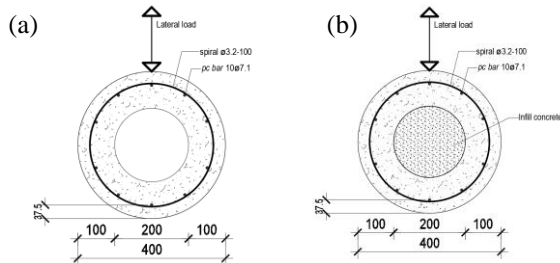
Test specimens of spun piles; (a) spun piles without concrete infill (S-TB-1 and S-TB-3); (b) spun piles with concrete infill (S-DB-1 and S-DB-3) [5]
